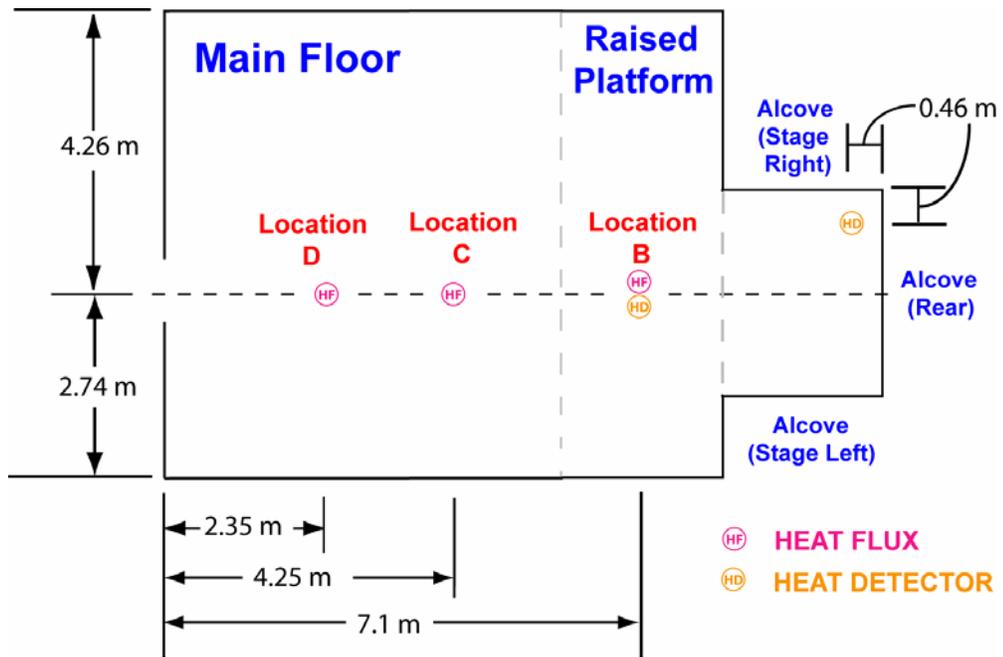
Schematic floor plan with heat flux and heat detector locations.
